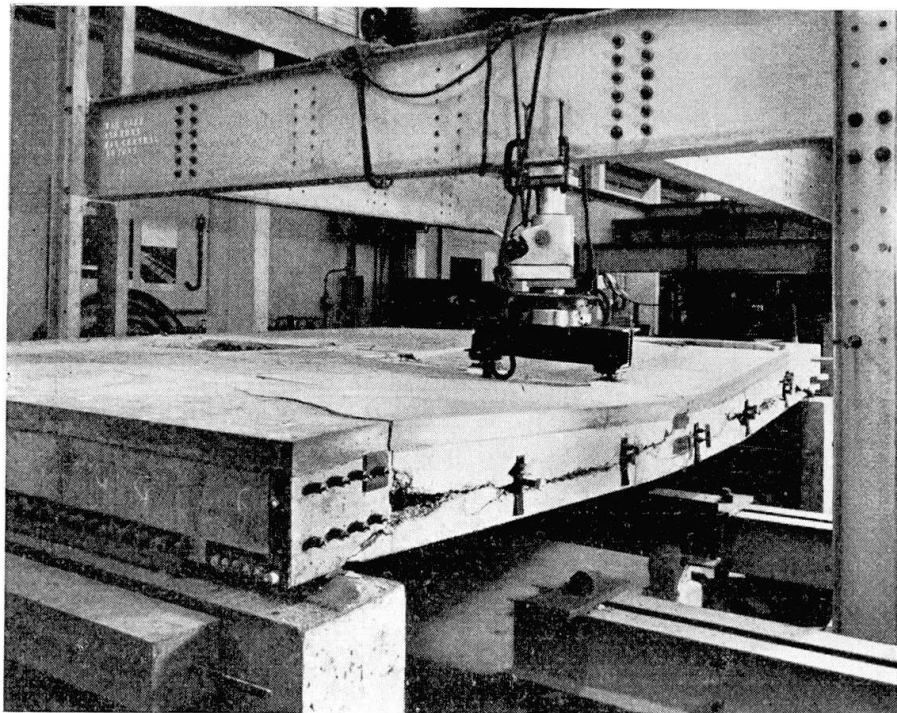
Box-Section Bridge — Loading No. 8 — Torsional Failure of Edge Beams.
